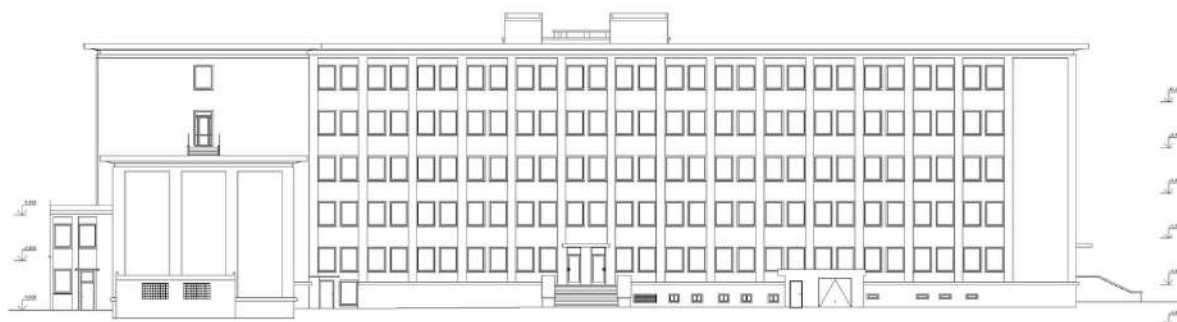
South-east view (courtyard side) - new planning. Authors: PLURAL
